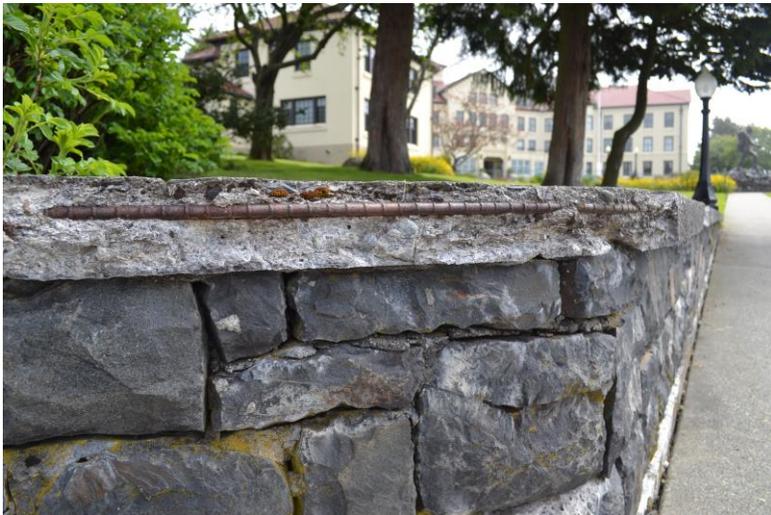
Damage to concrete cap of stone wall caused by corroded rebar.
